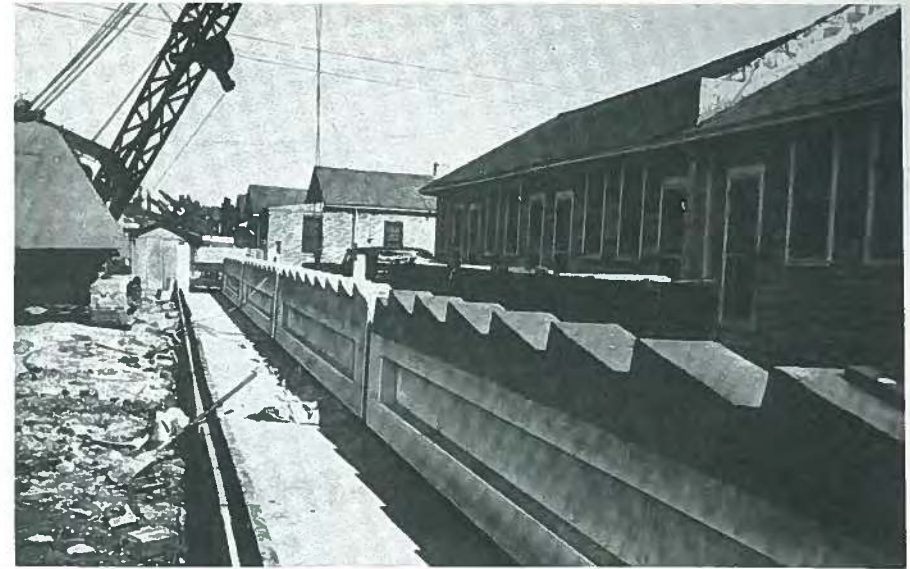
Pretensioned girders of Fig. 12 with concrete steps cast on top. These finished girders were used to support precast vacuum processed seats in Loyola University's stadium.
